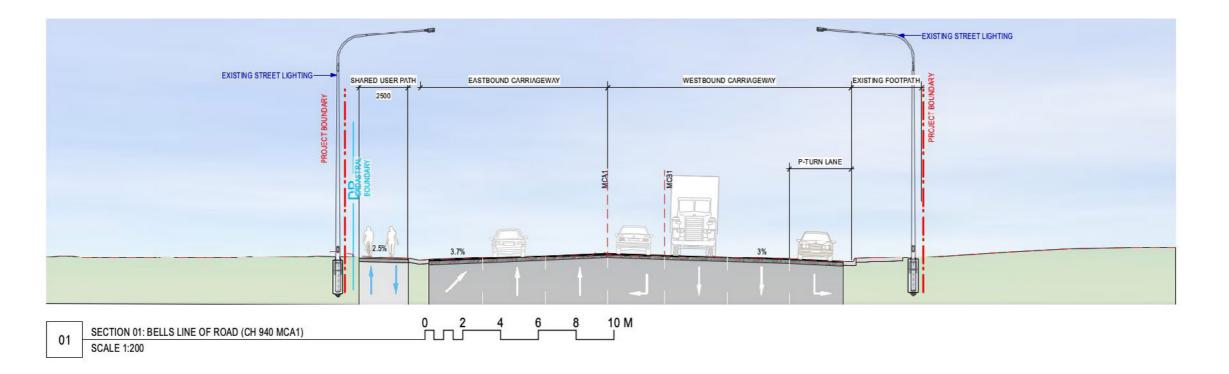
Stage 2B urban design sections - sheet 1 of 3
